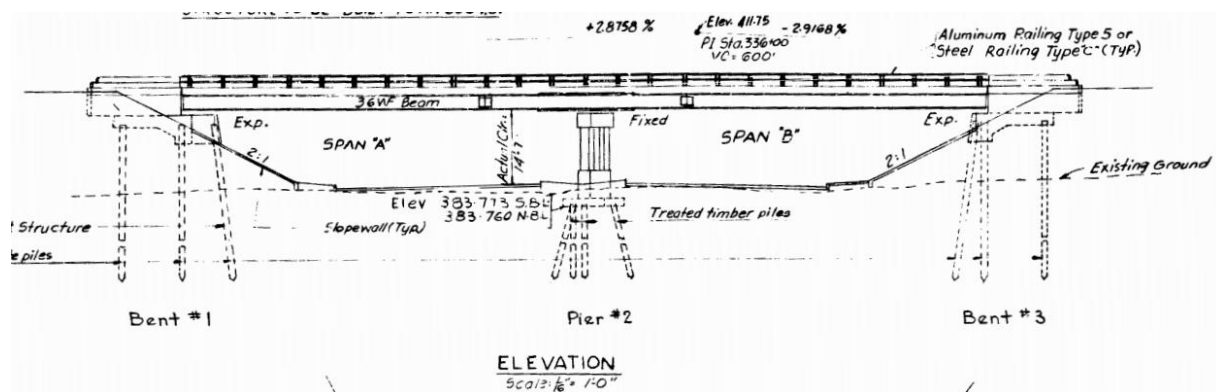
Elevation View of the Bridge (NBI 14280) (1967)
